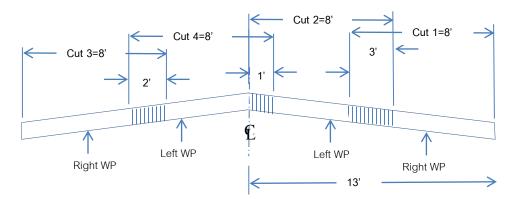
Typical Cut Detail Indicating Location for Longitudinal Joints
